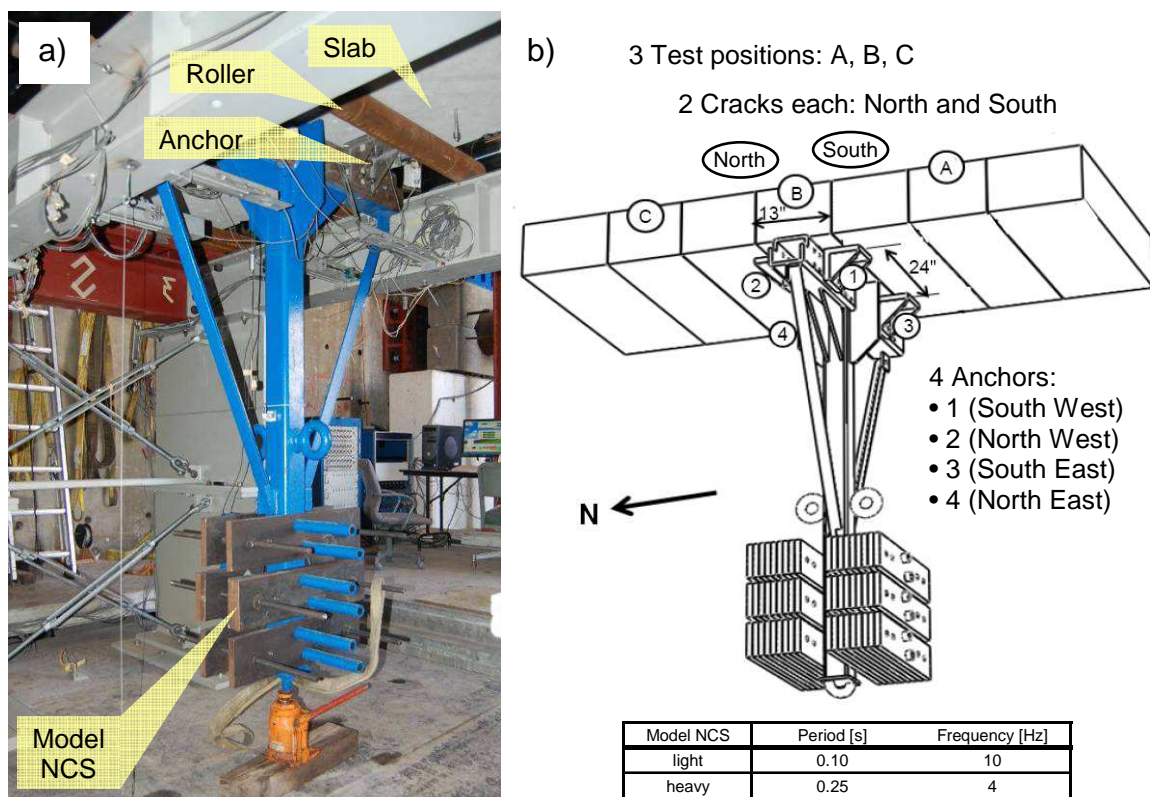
a) Photograph of test setup; b) Drawing of model NCS and concrete slab
